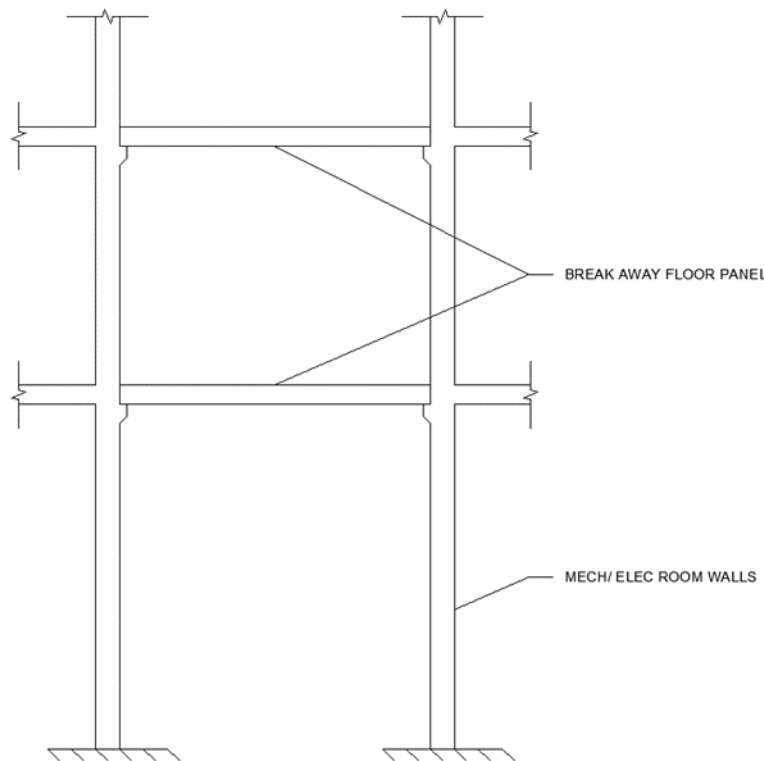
Mechanical/Electrical room break-away floor panels applied to all levels up to h_{\max}
